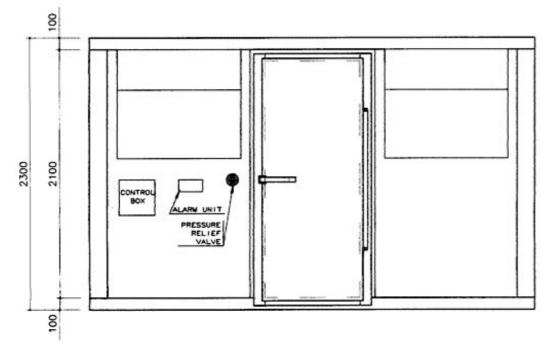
Front view of 30 m³ WIF (Dimensions in Cms)
